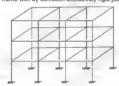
An apartment building with the main load-bearing structure constructed of beams and columns.
